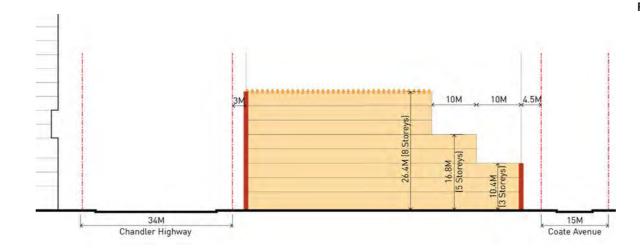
Proposed built form envelopes (section B-B) with indicative floor levels illustrated within this envelope for reference only. These are not intended to illustrate acceptable building designs.
